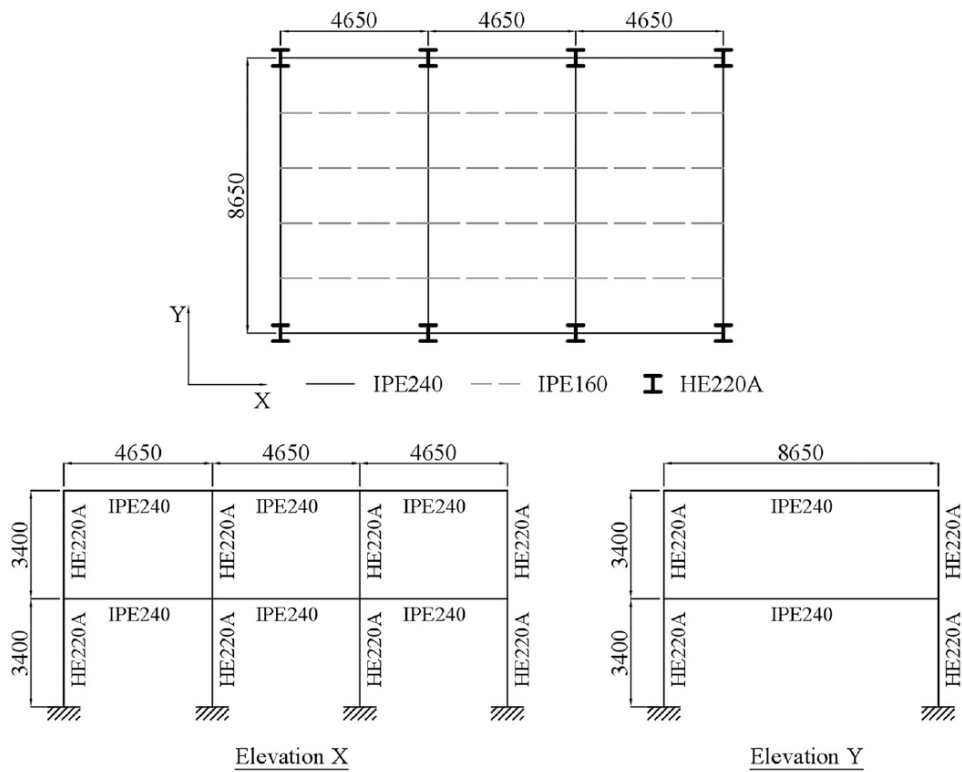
Global geometry of the prototype building: plan view and elevations (unit: mm) (from Di Sarno et al. ^[1])
